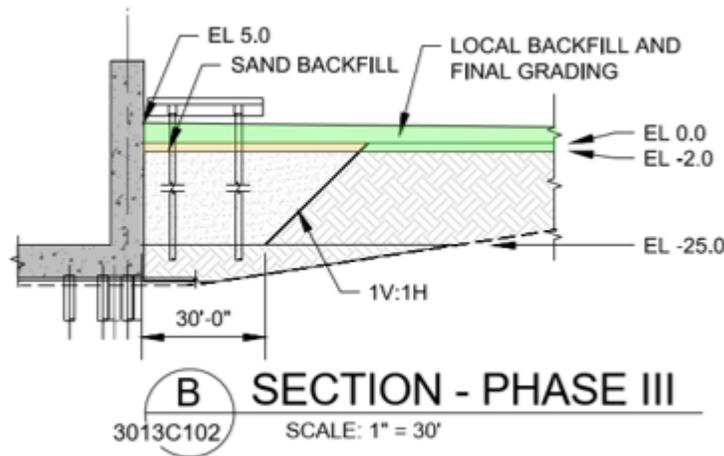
Compacted Local Backfill – Phase III (View at U-frame and Gated Structure Walls)
